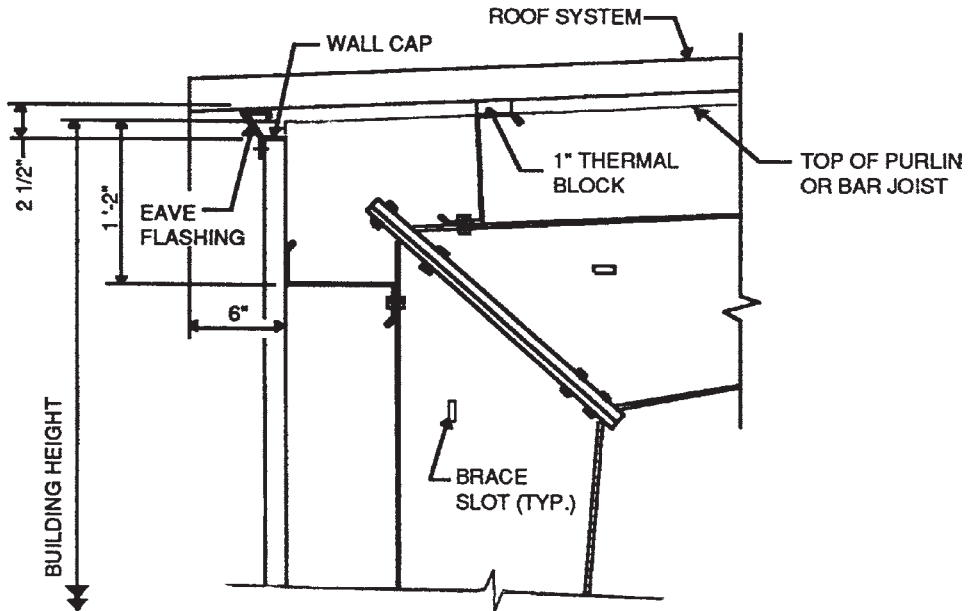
A system without eave struts. (Steelox Systems, Inc.)
